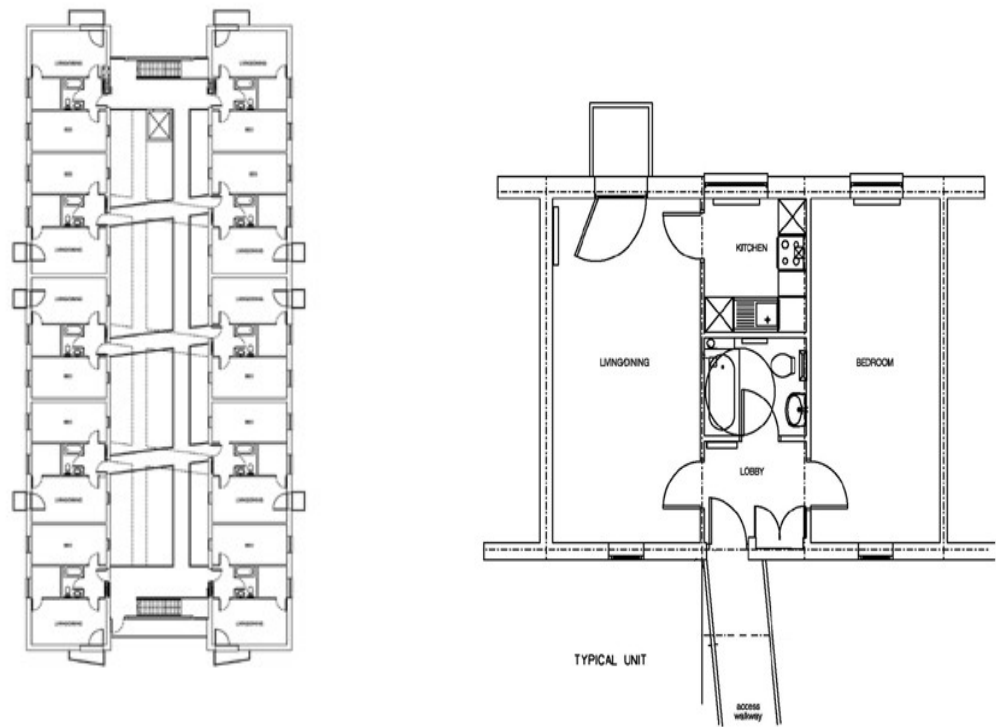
Typical floor plan (right)/cross-section (left) of CARSPAR 1
